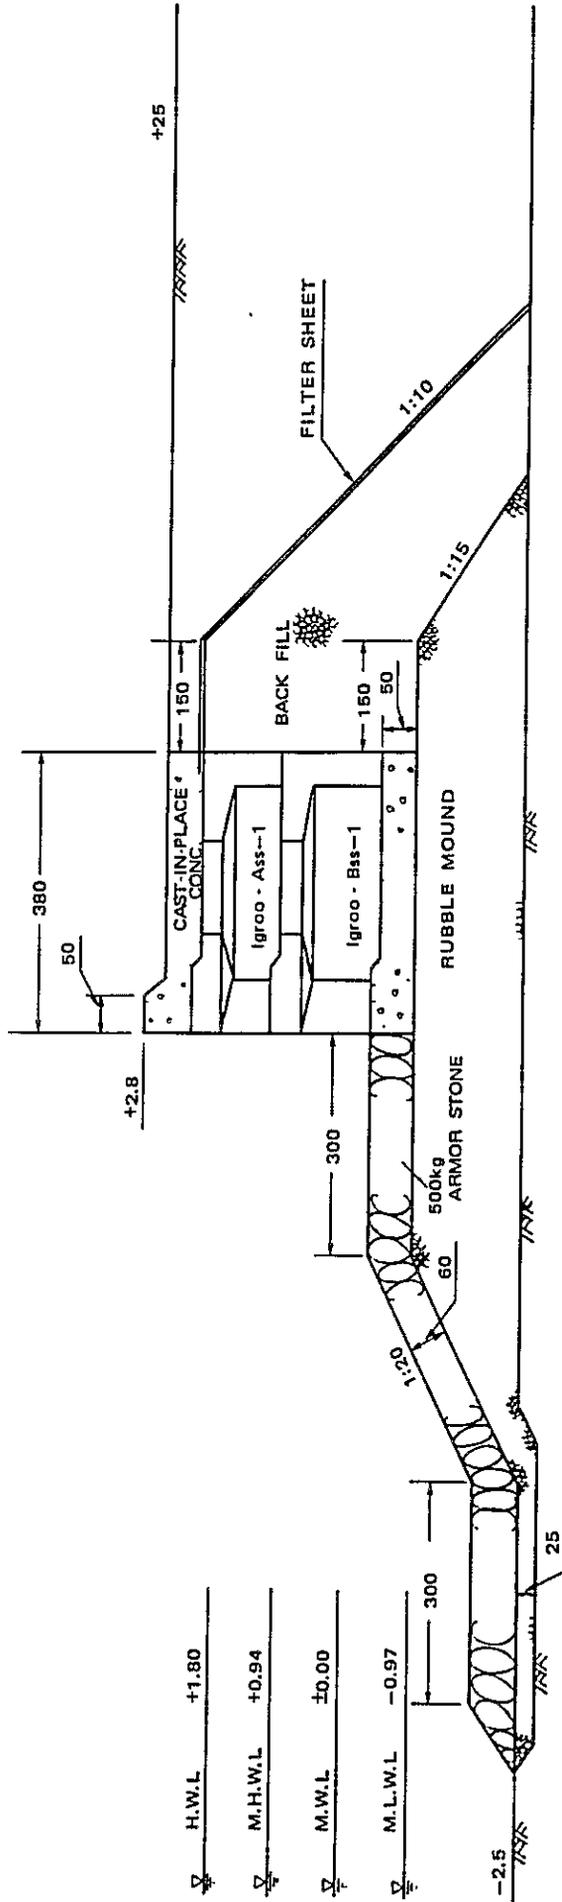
Standard Cross Sections of Reclaimed Revetment
